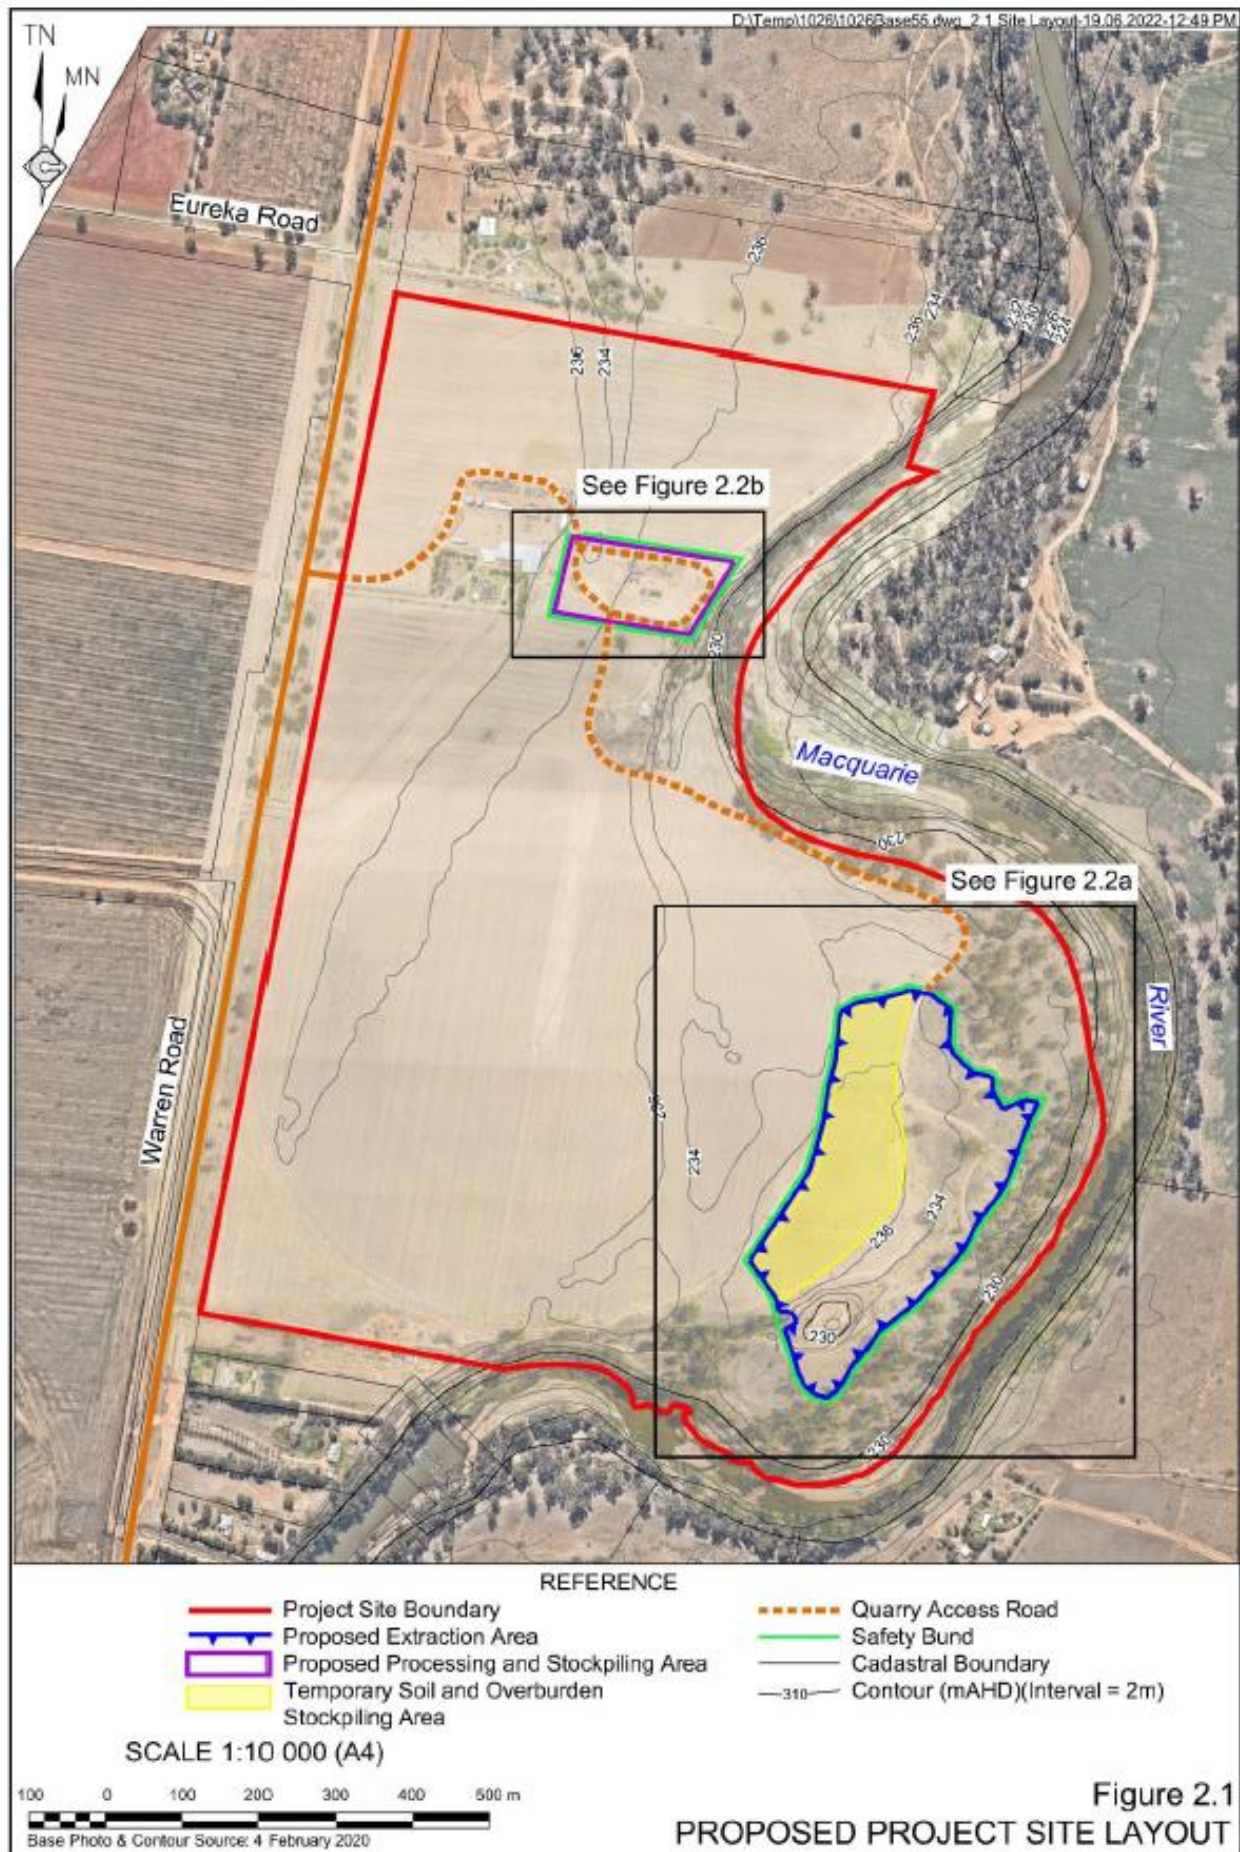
Proposed site layout (R W Corkery & Co 2022)
